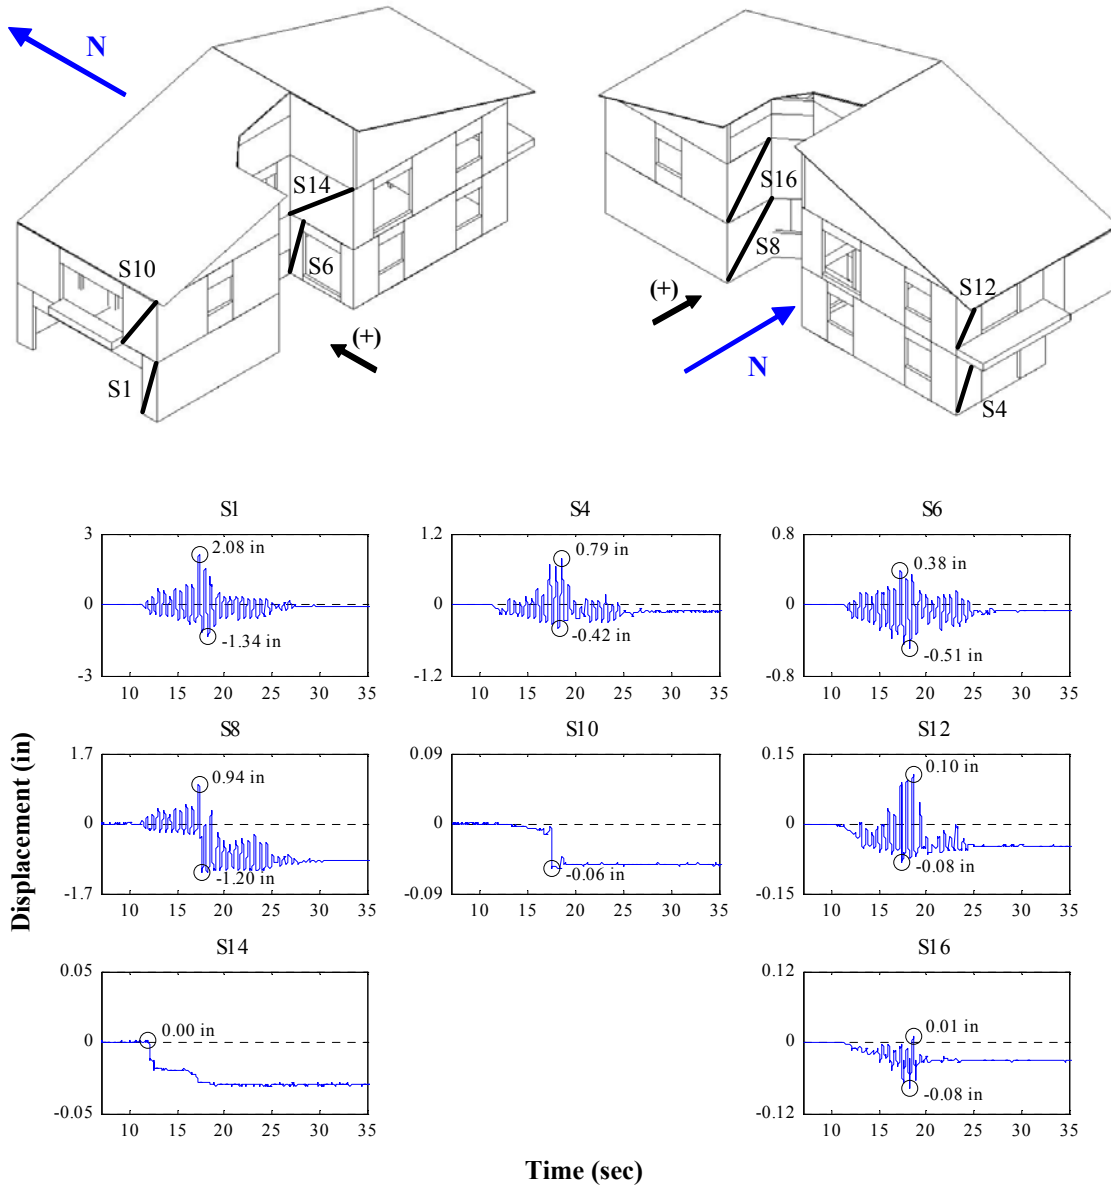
Wall deformations of north-south external walls for Test NWP5S08
